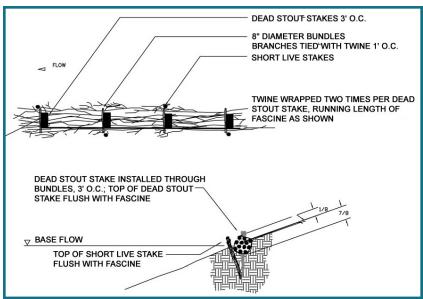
Fascine details, plan and cross-section. Not to scale.
